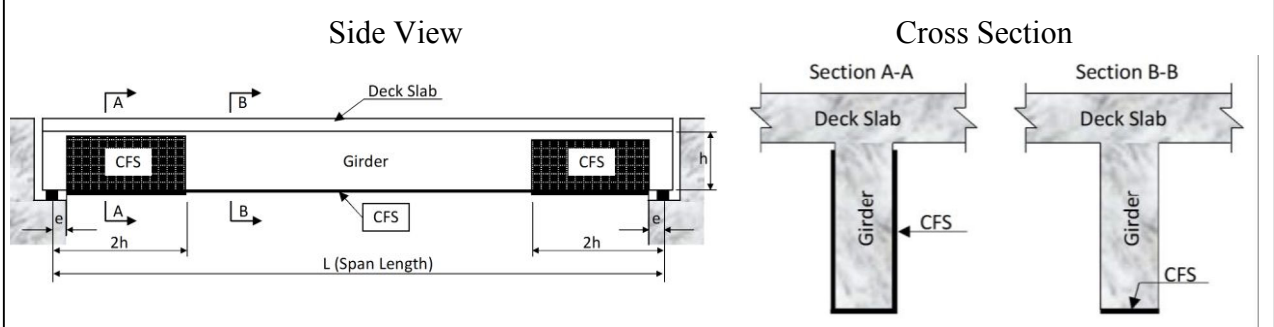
Reinforcing Girder by Carbon Fiber Sheet
